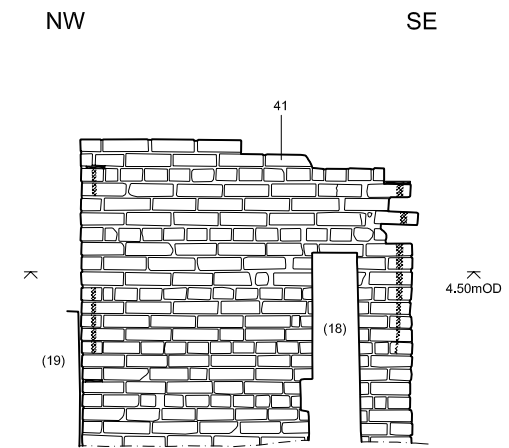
Half Forge and Forge Buildings. Wall [20], elevations
